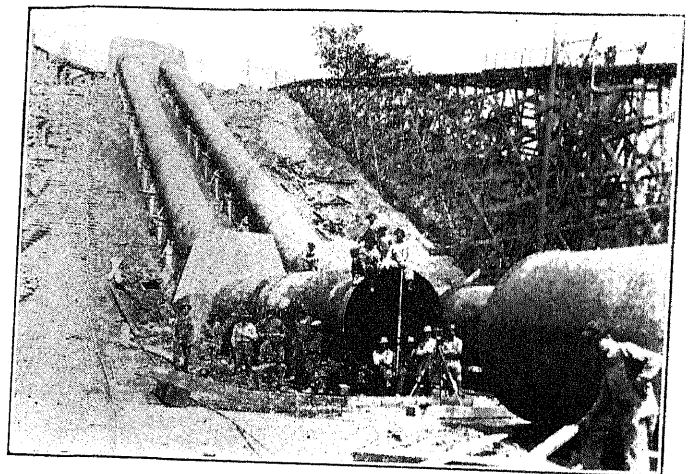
PIPE LINE CONSTRUCTION (WELDED)
